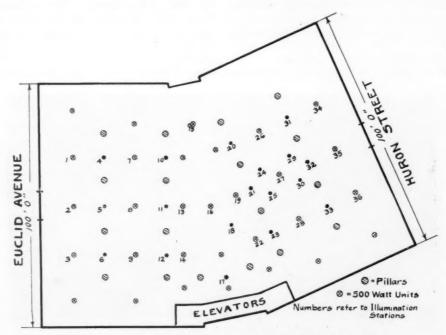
Ground Plan of the Halle Bros. Co. Installation of 500-Watt Mazda Lamps
